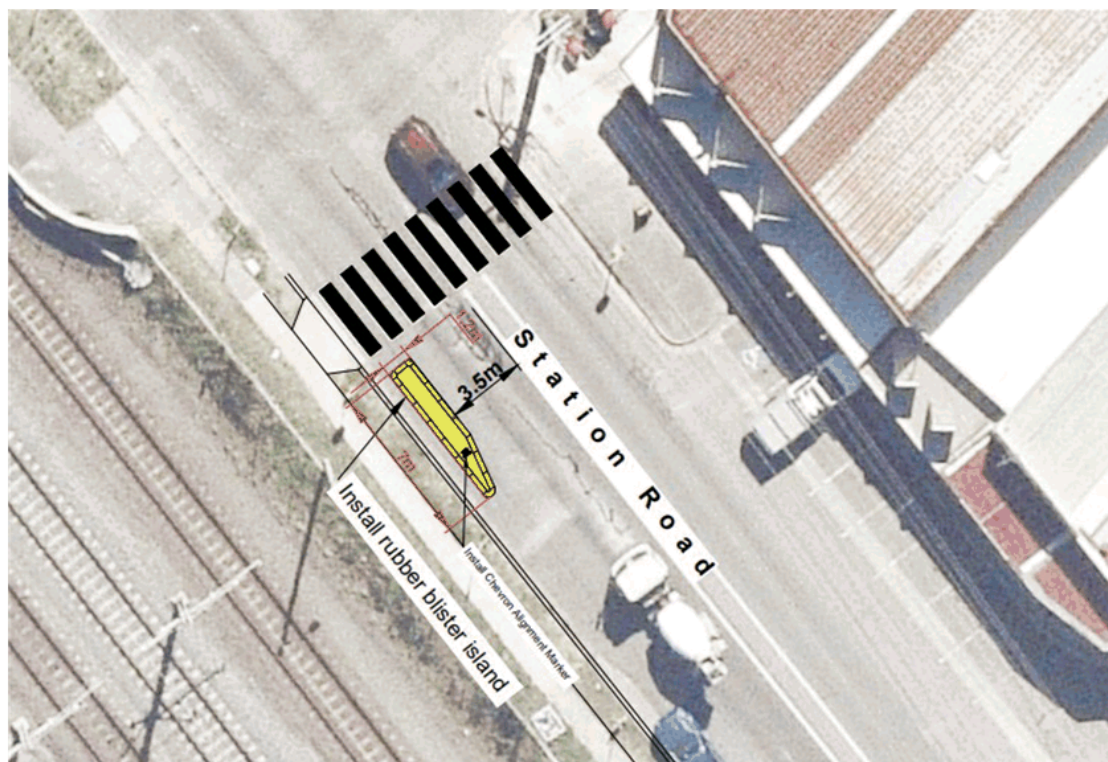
Current concept plan of the proposed traffic facilities on the northbound to the at-grade pedestrian crossing in Station Road south of McCoy Street, Toongabbie
